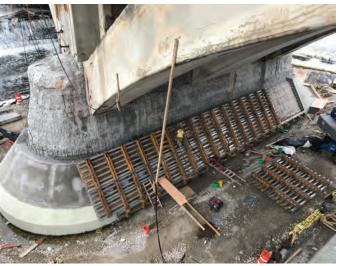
Concrete removals completed, reinforcing steel being placed, and new pier jacket concrete being formed and placed (photograph by WJE)
